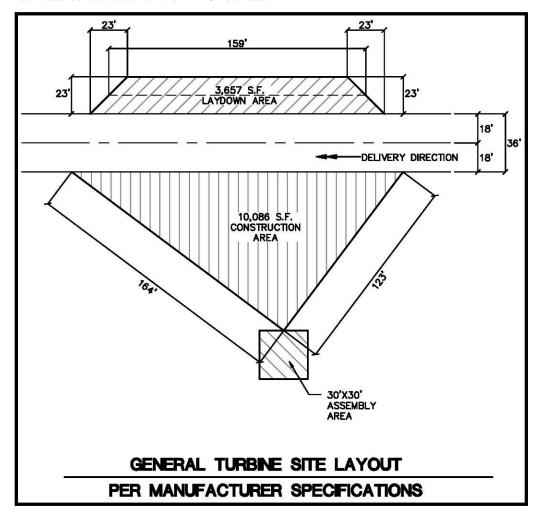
Typical WTG Pad Laydown and Construction Area
